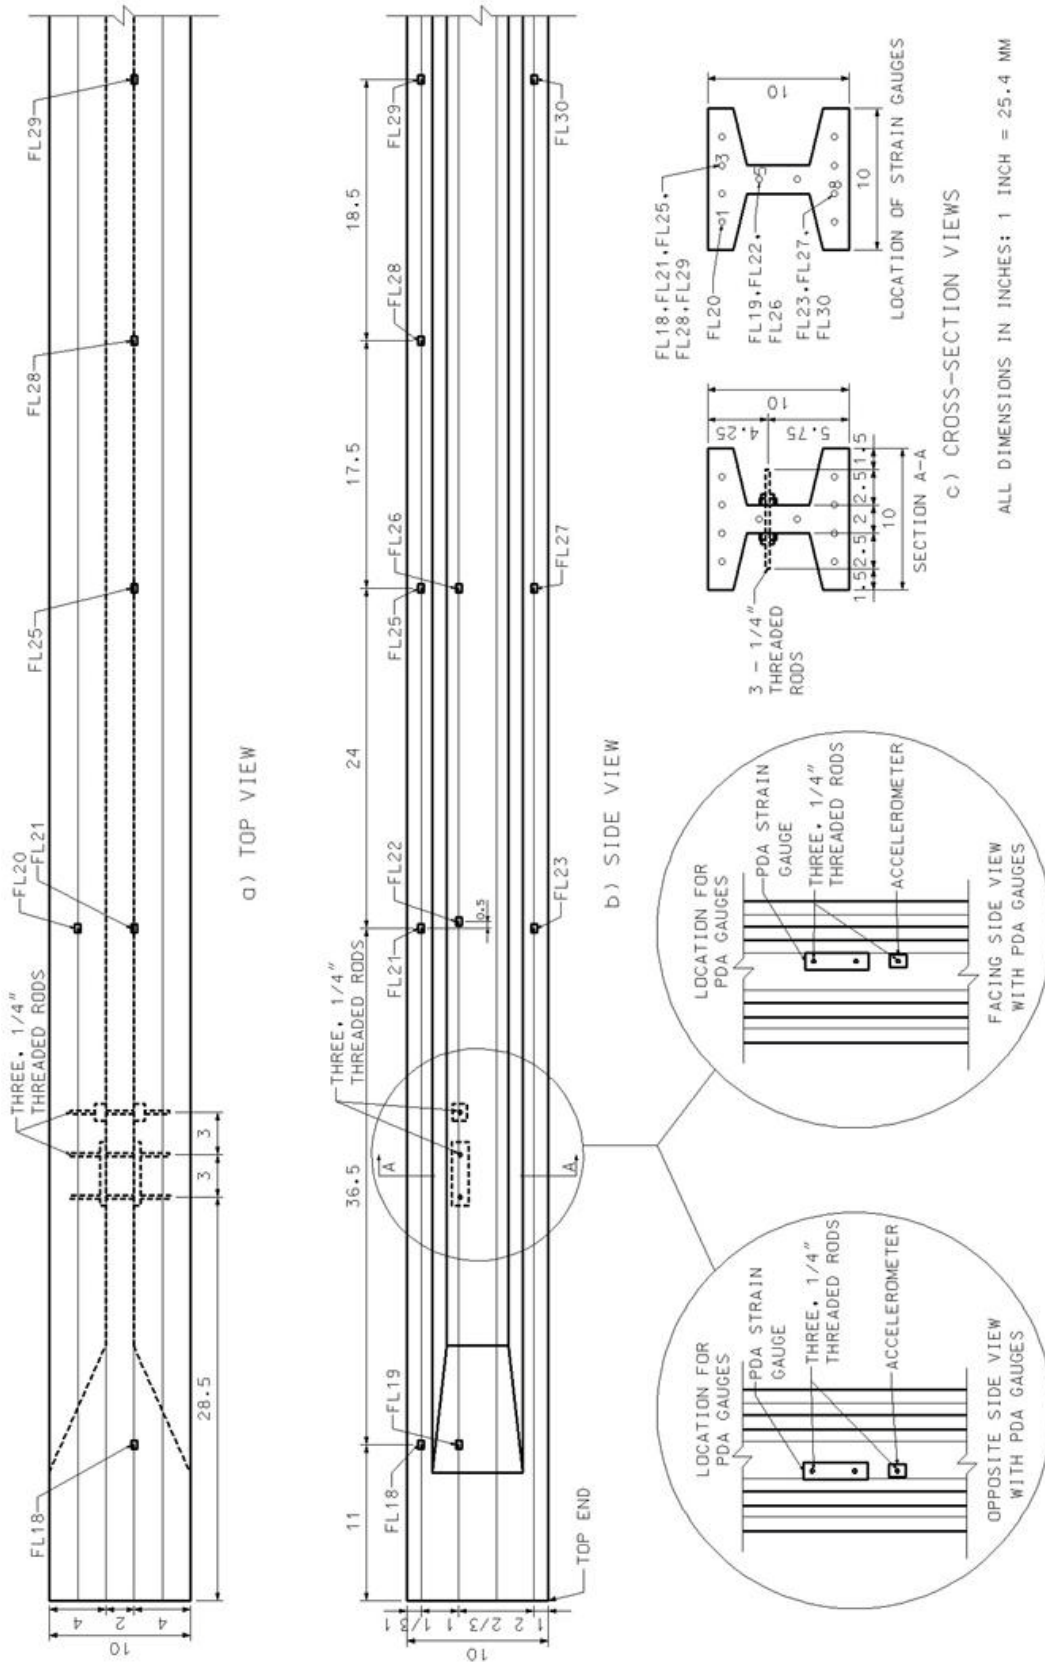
Details of instrumentation used for 35-ft (10.7-m) long UHPC field test pile P2
